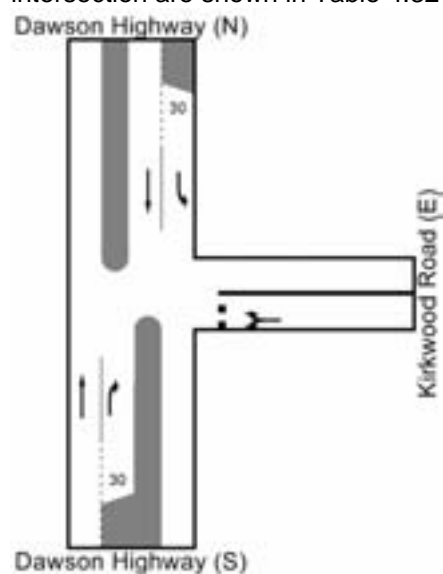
Existing Dawson Highway/Kirkwood Road intersection
